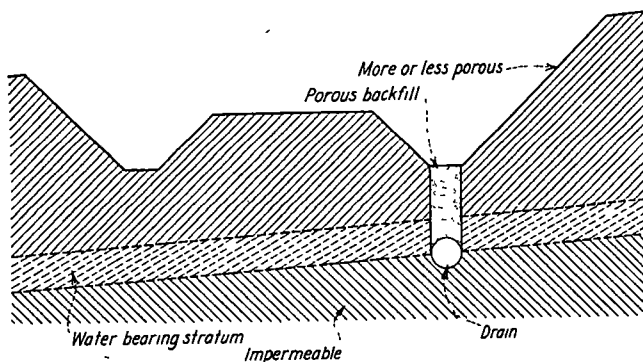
Underdrain Eliminating Seepage Condition Should Be Placed Below Plane of Seepage. Note porous backfill.
